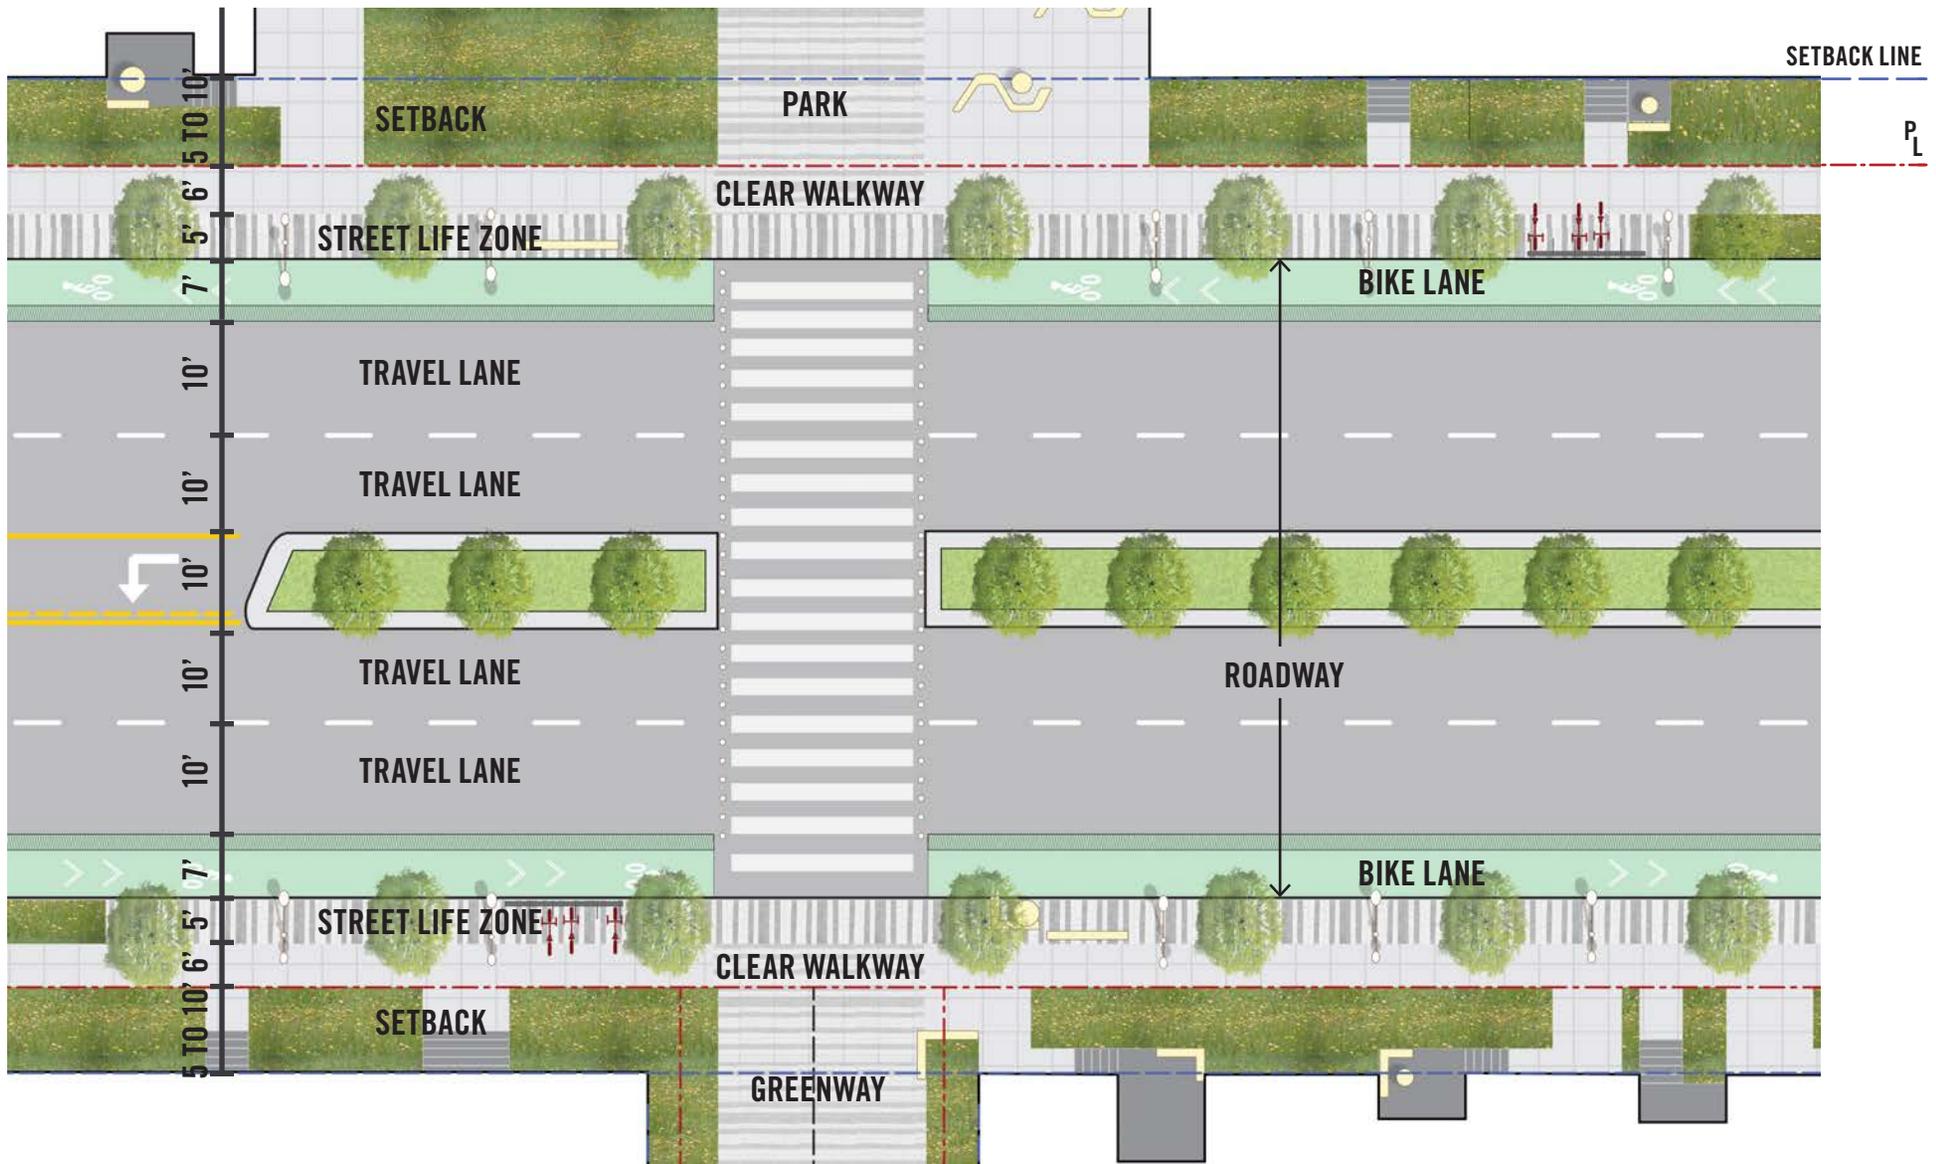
Lick Mill Boulevard Street Plan: Between Tasman and Calle de Luna
